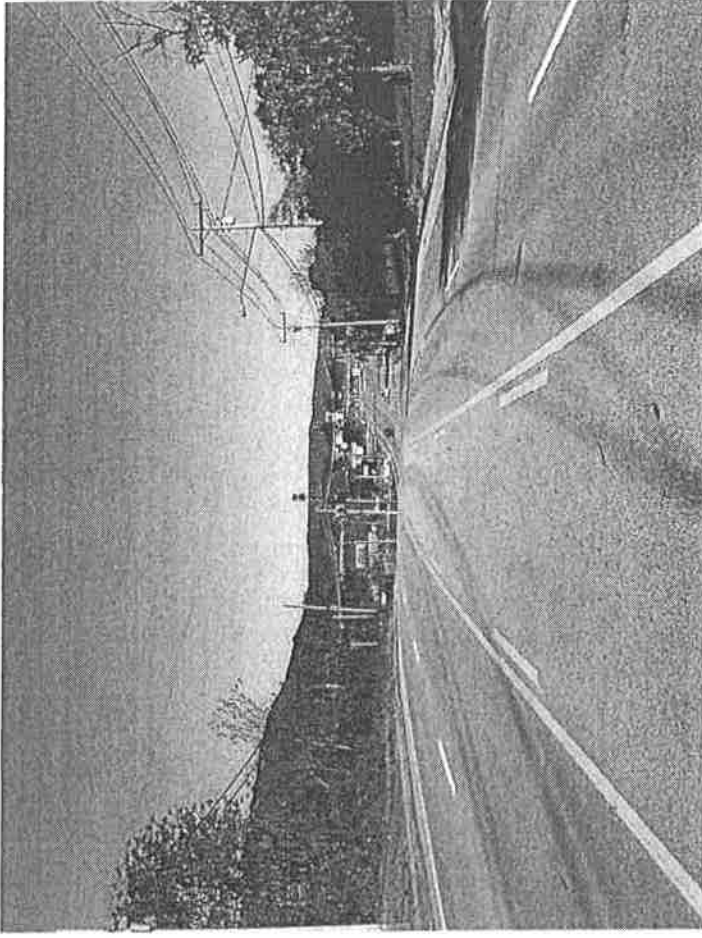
Brown's Ferry Road Oct. 2017 looking toward Interstate-24
